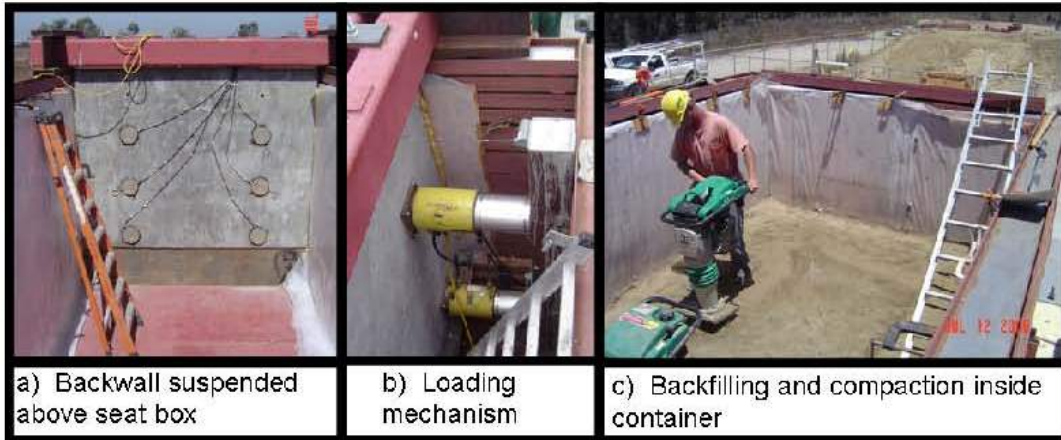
Test setup of soil container on LHPOST shake table utilized for 2006 bridge abutment experiment showing suspended backwall, loading cells, and backfilling operations [6].
